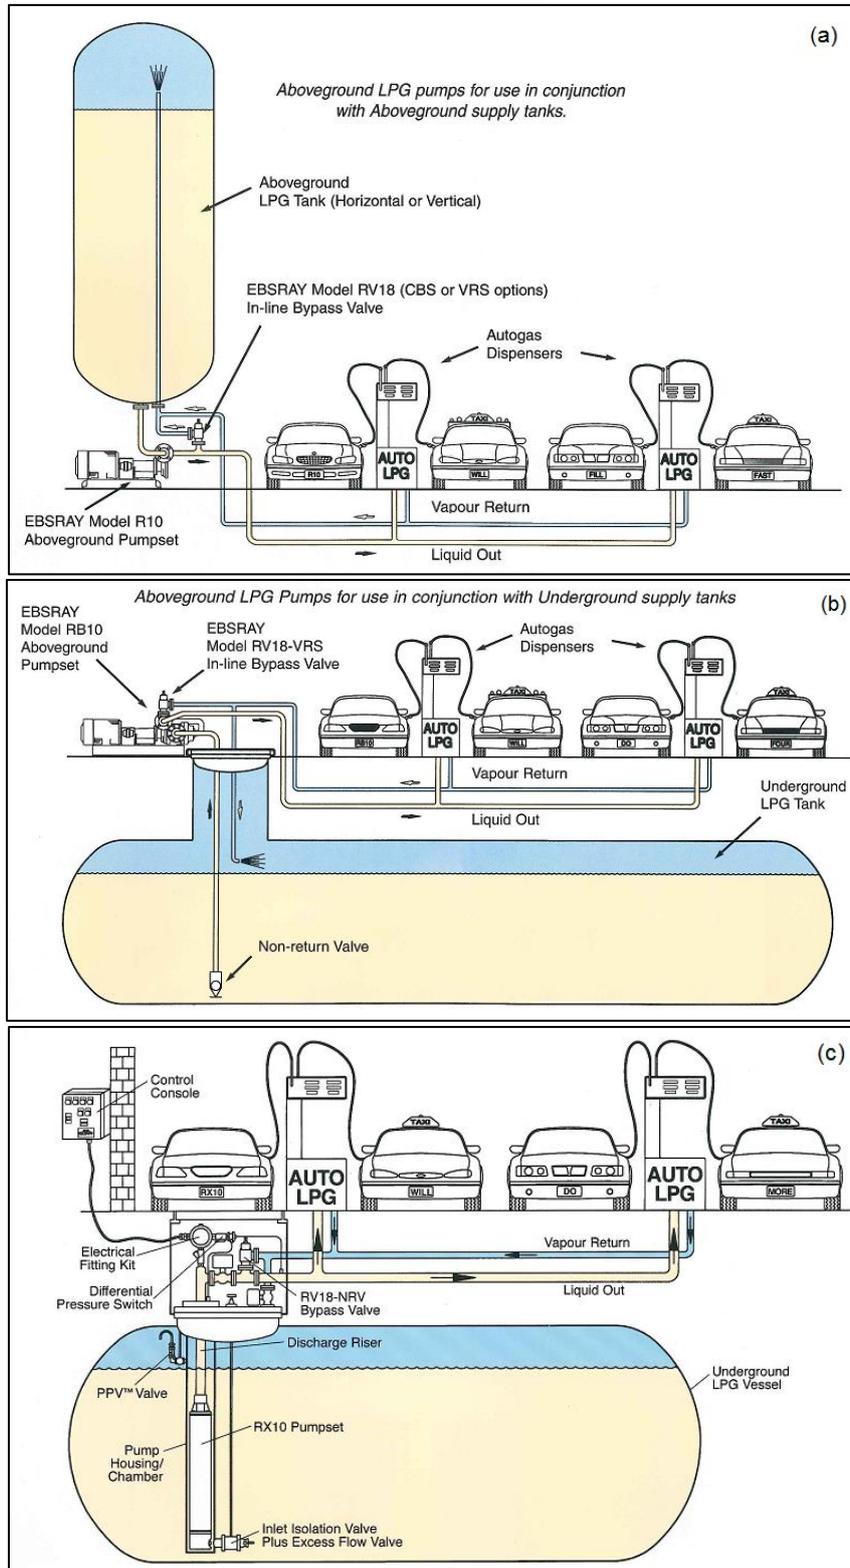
Typical LPG installation in refueling site: (a) Above-ground, (b) Lifts on the underground, and (c) Submersible on underground [71]
